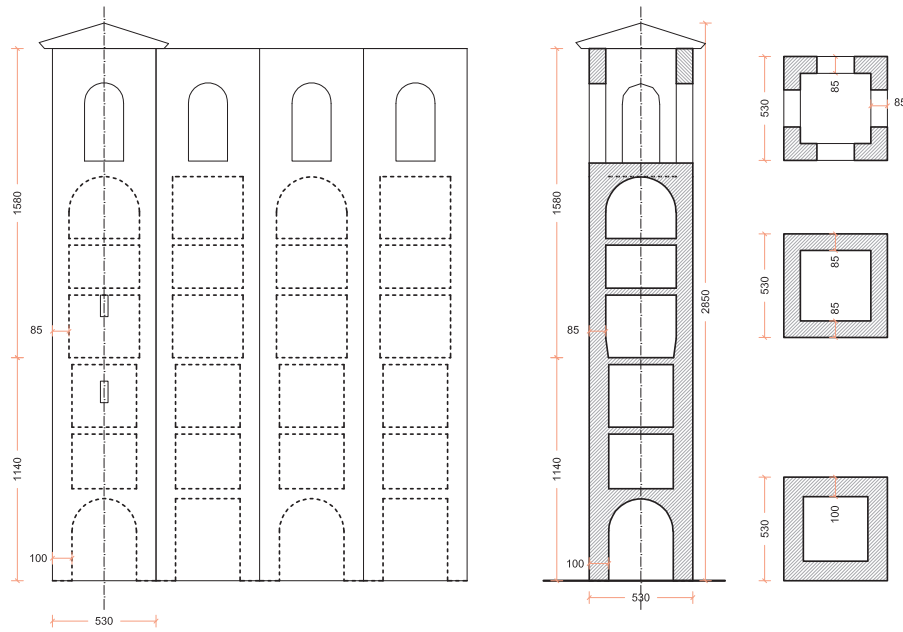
Schematic prospects, section and plan views of the idealized case study.
